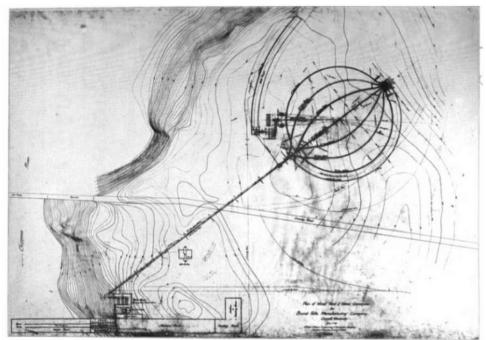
Plan of the Brunet Falls Manufacturing Facility, 1913, with dam and mill buildings at lower left, and mill yard and stacker at upper right ("The New Plant of the Brunet Falls Mfg. Co.," 128).
